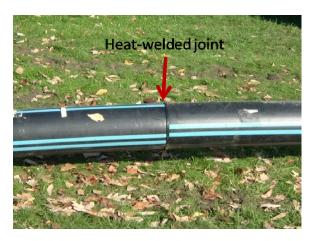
Heat-welded HDPE pipe joint
